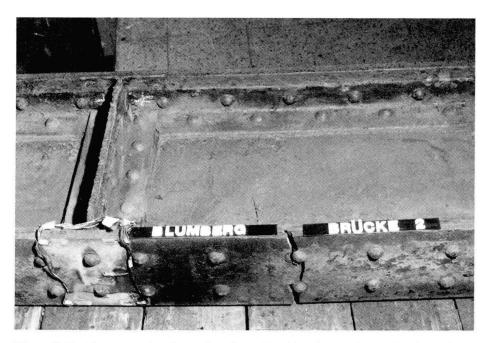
Failure mode for the longitudinal girder of the Blumberg bridge
